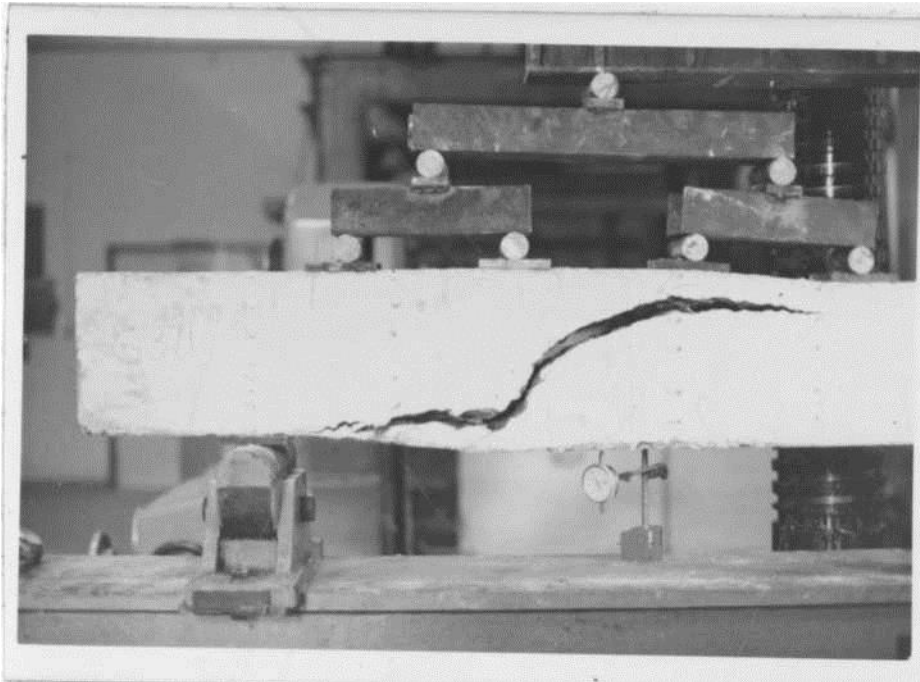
Close-up ϵ_t failure diagonal crack of beam G3/1
